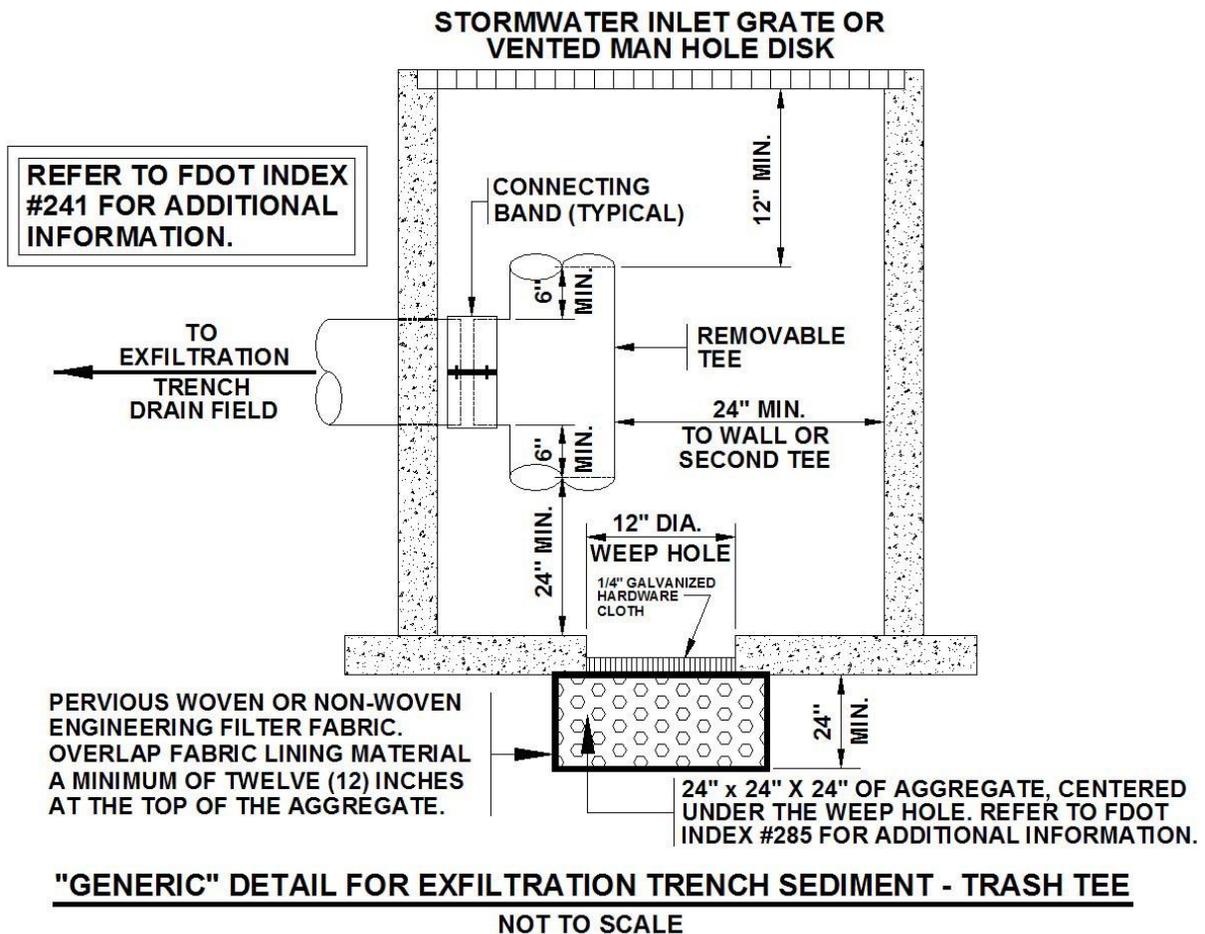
Generic Detail for a Typical Exfiltration Trench Trash Tee
